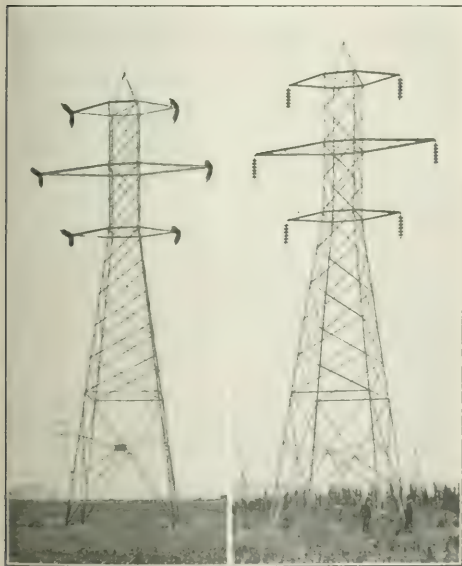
ANGLE TOWER AND DEAD END      FIG. 67—STANDARD TOWER OF SYSTEM
